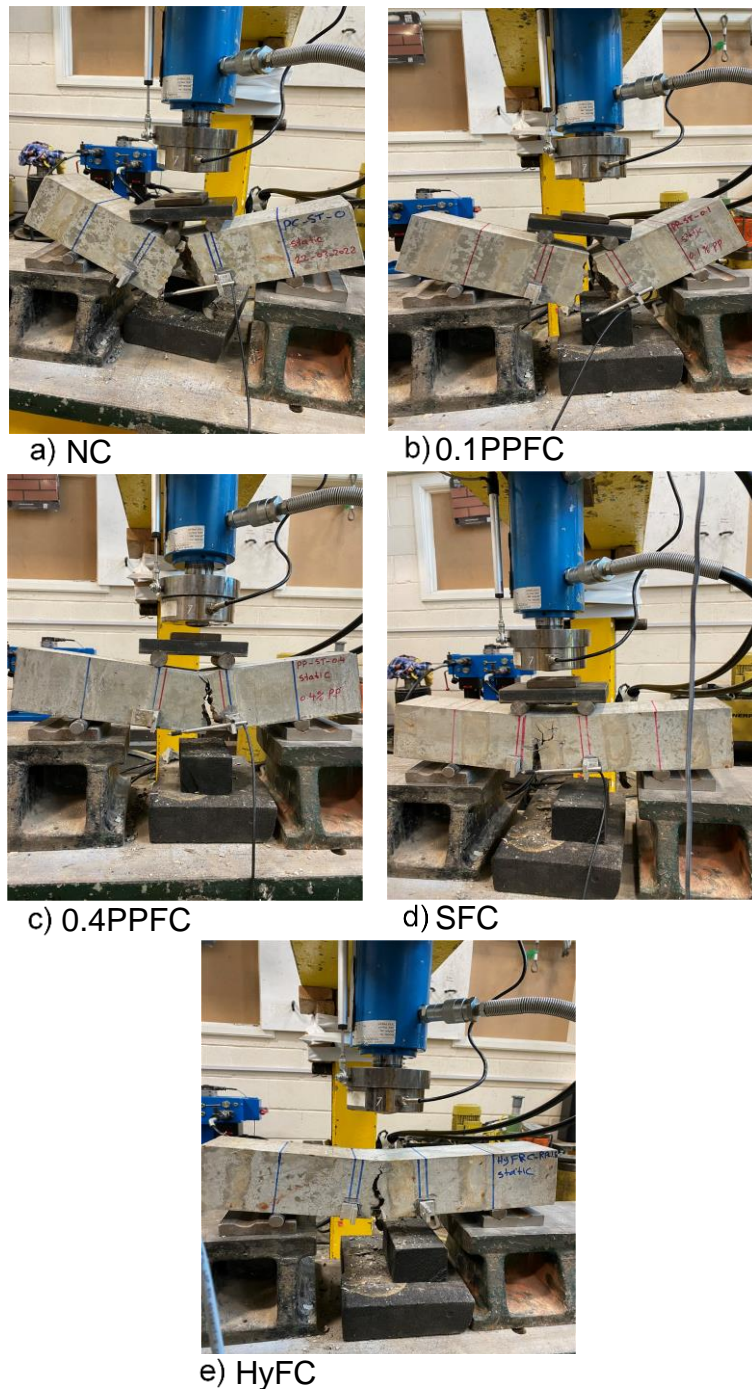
Crack pattern and mode of failure for normal and fibre concrete beams
